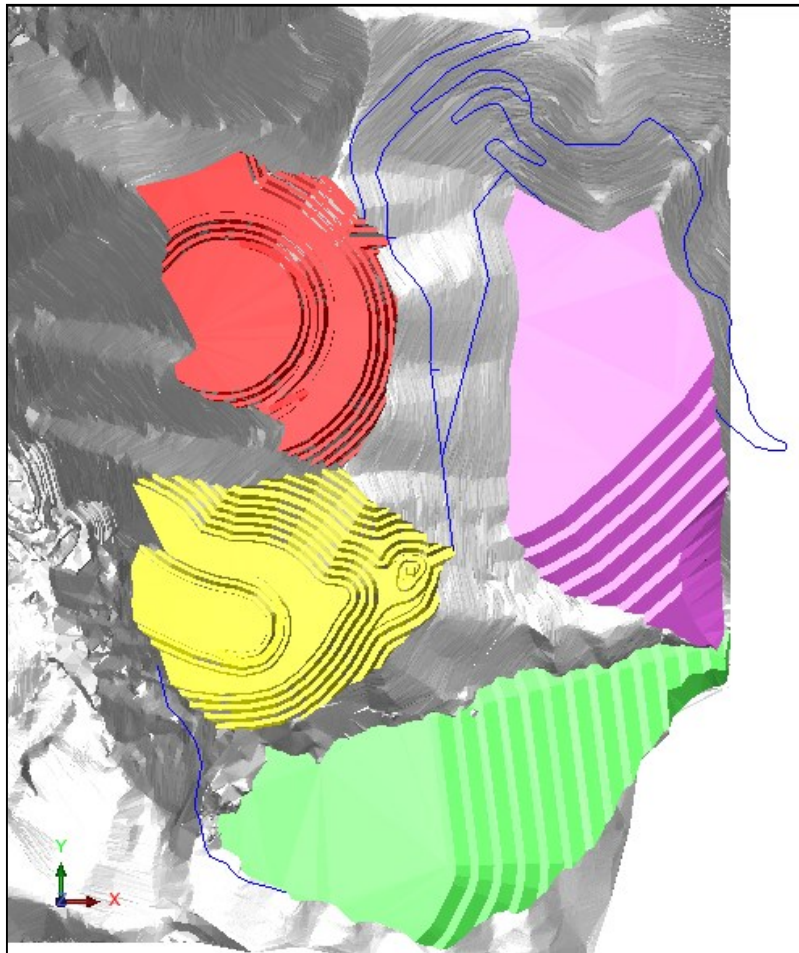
Open Cut 2023 (Year 10) Stage Plan
